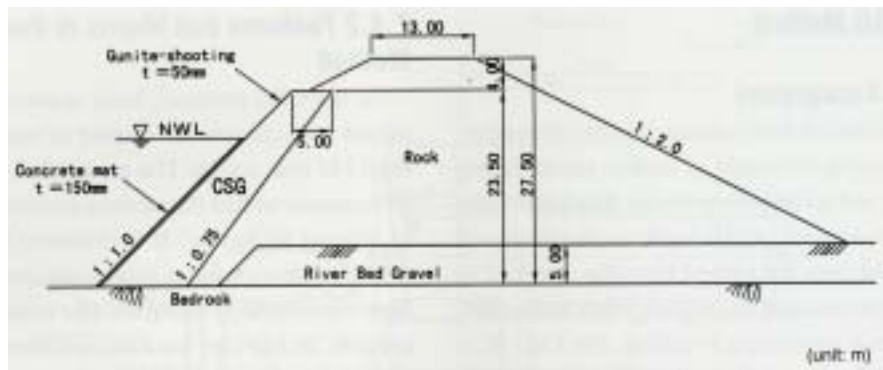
Typical Cross Section of Cofferdam(Surikamigawa Dam)
